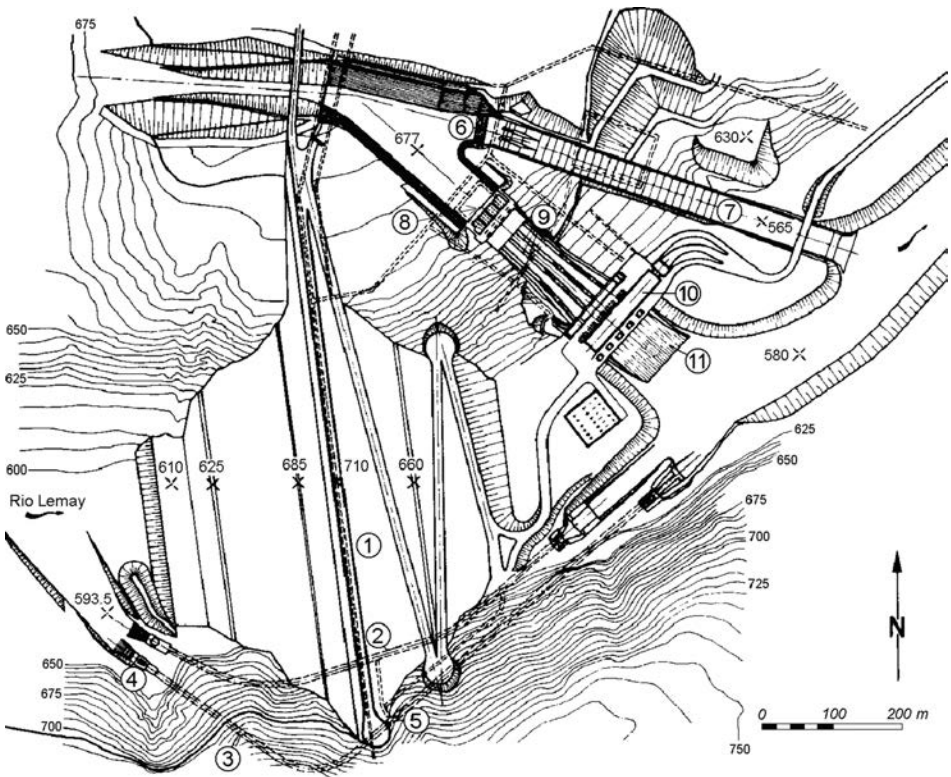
Layout of the hydraulic scheme at the Alicura Dam. (1) Dam. (2) diversion tunnel No. 1; (3) diversion tunnel No. 2; (4) intake of bottom outlet; (5) valve chamber of the bottom outlet; (6) spillway; (7) stilling basin; (8) intake for the hydroelectric power plant; (9) supply pipe conduits under pressure; (10) powerhouse; (11) tail race.
